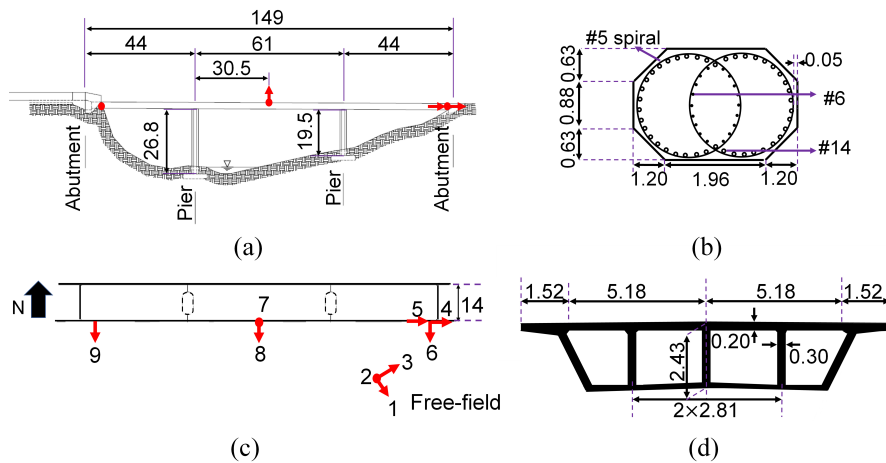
The SRC bridge geometry and its instrumentation layout: (a) elevation view, (b) pier section, (c) plan and accelerometers layout, and (d) deck section. All the dimensions are in meters.
